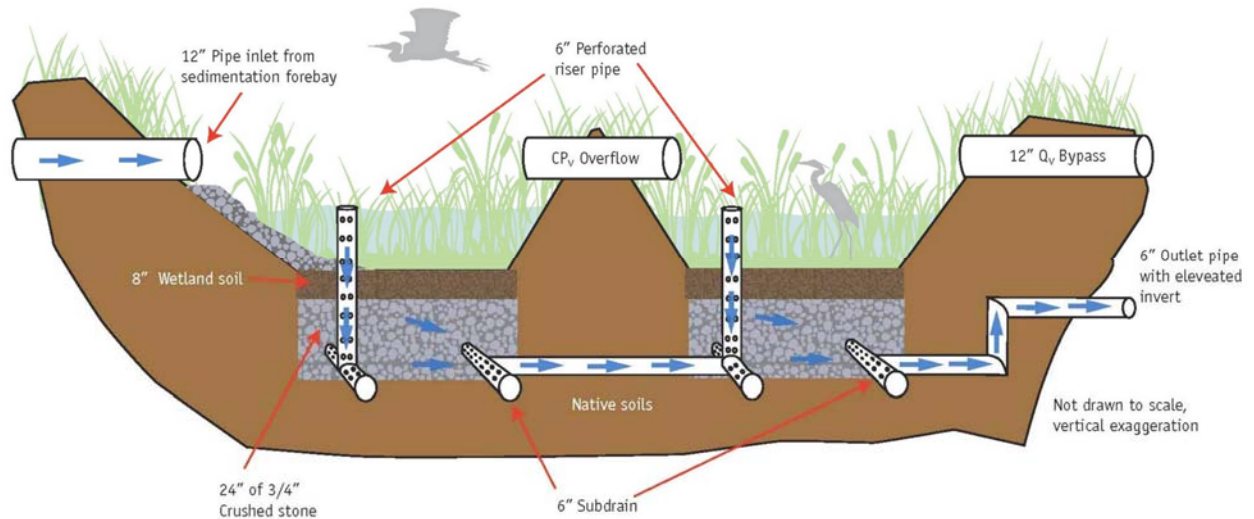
Gravel Wetland Cross-Section Detail (Source: UNH Stormwater Center)
